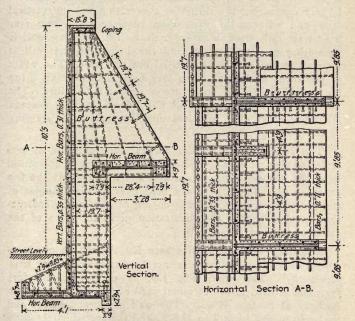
Retaining Wall for Sunken Street, Paris, France.
